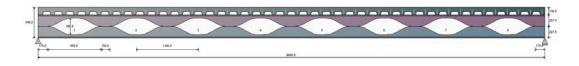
Geometry of the ANGELINA[™] beam composite section
